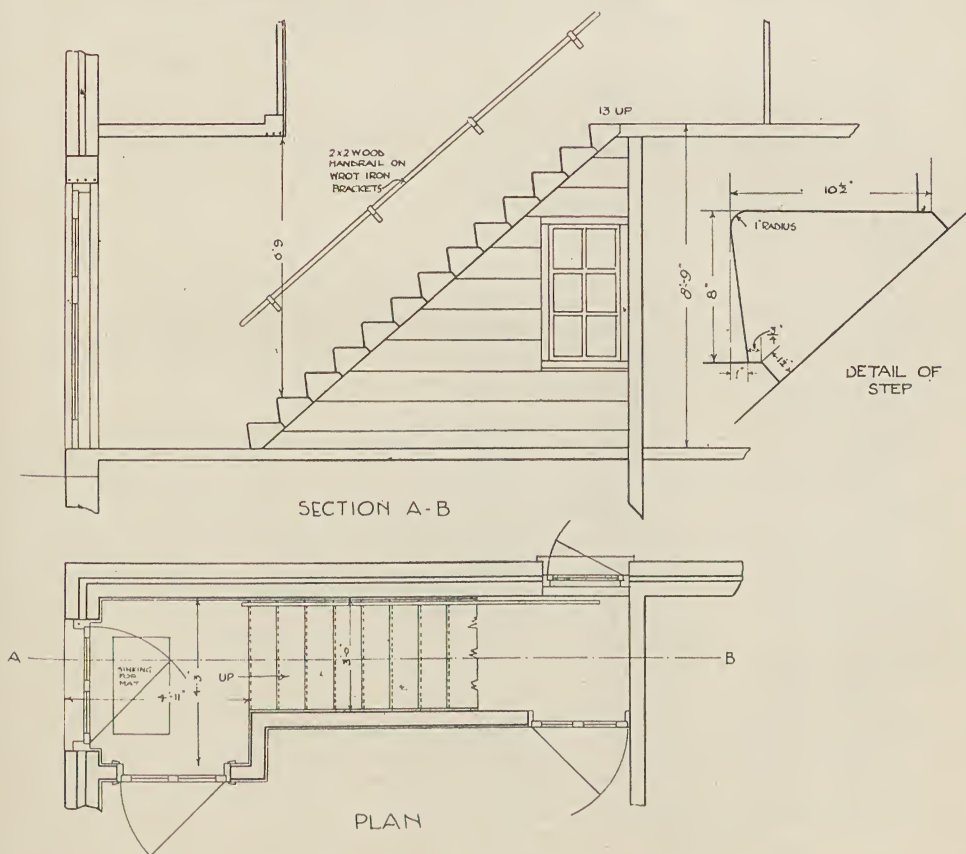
DETAIL OF STAIRCASE WITH PRECAST STEPS.
